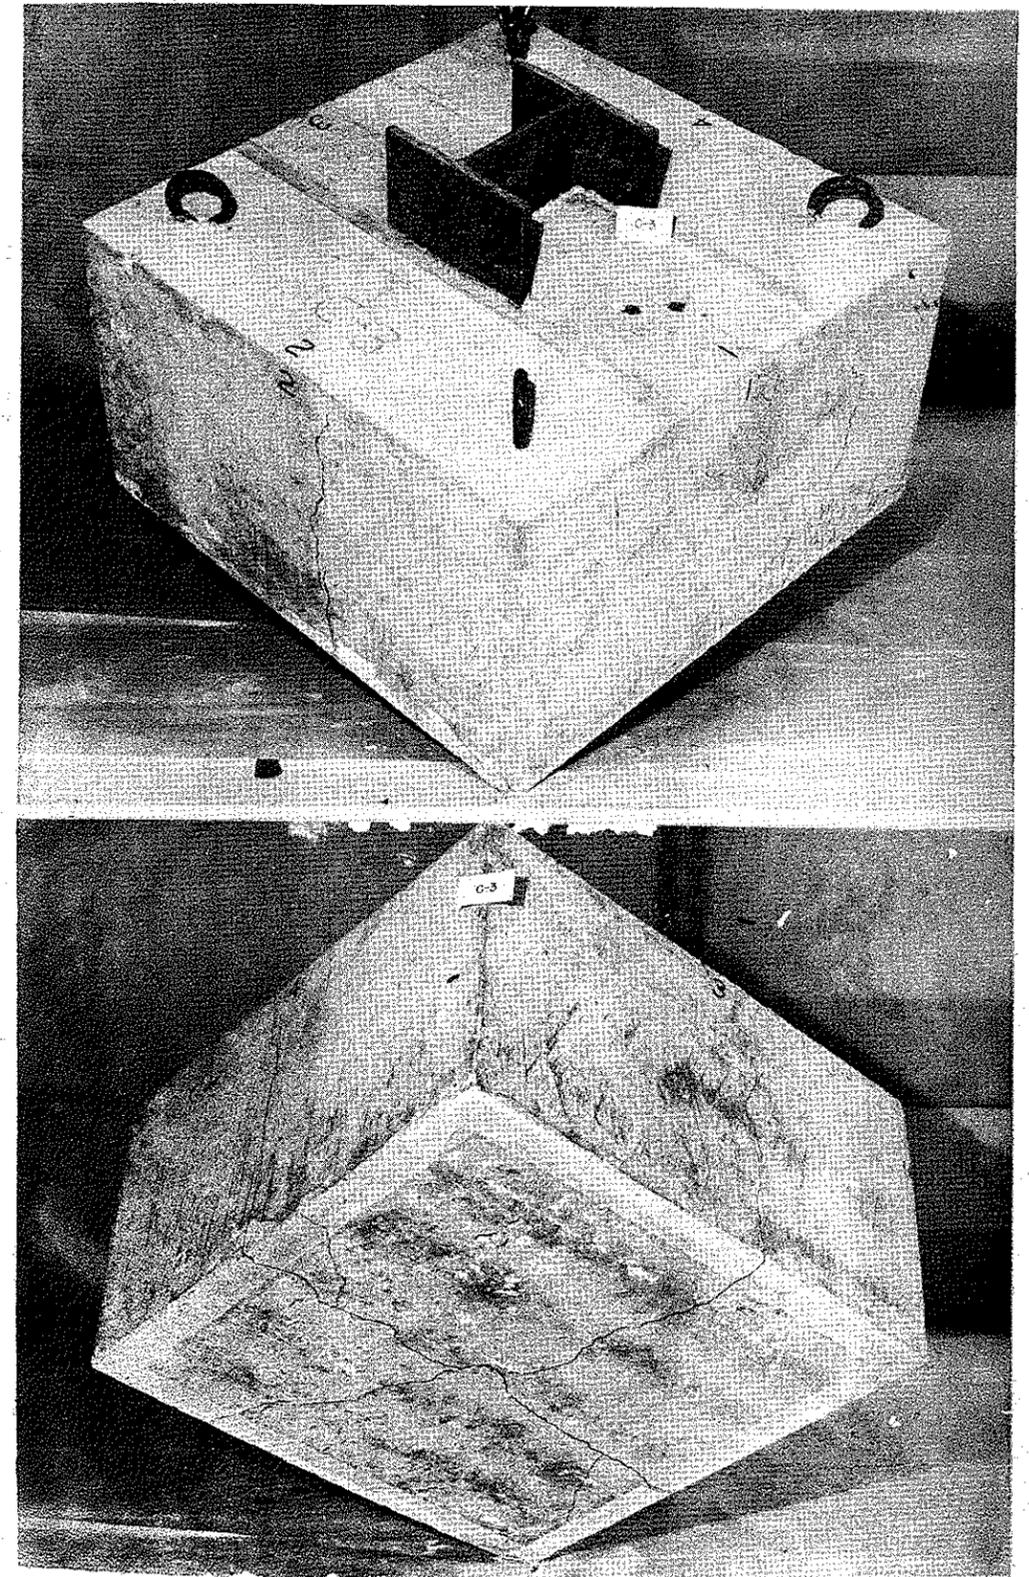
APPEARANCE OF SPECIMEN C-3 AFTER TESTING.
